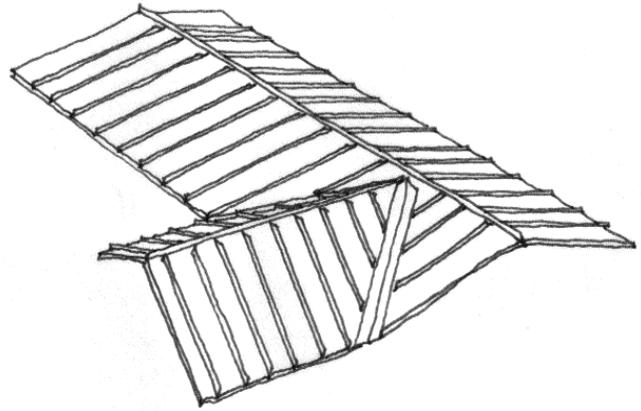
Example of historic standing seam metal roof. The pattern of standing seams on a metal roof contributes to the historic character of the building and the street-scape.
